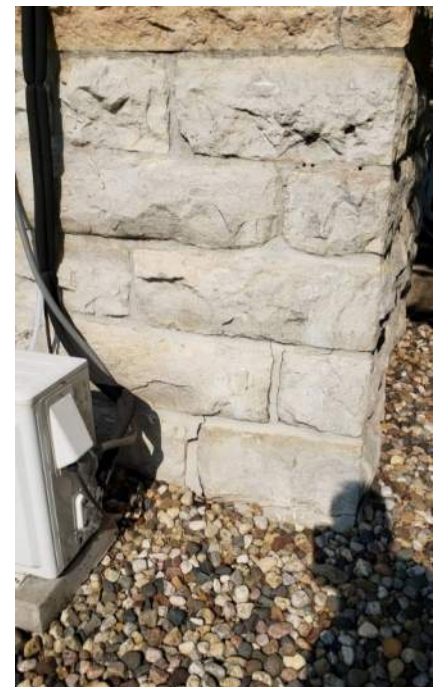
Cracking at limestone foundation at southwest corner
